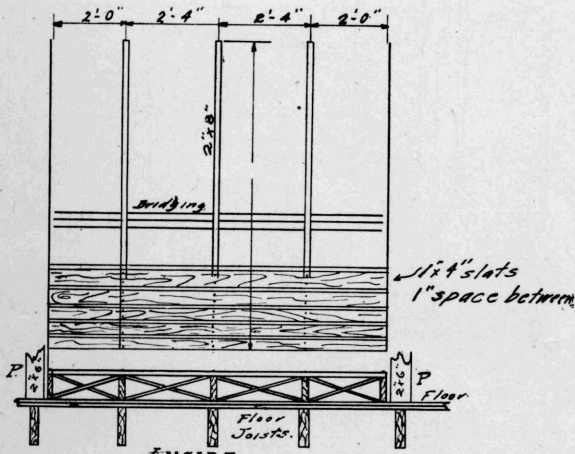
Drawing showing plan of ventilation floor doors and flue.
